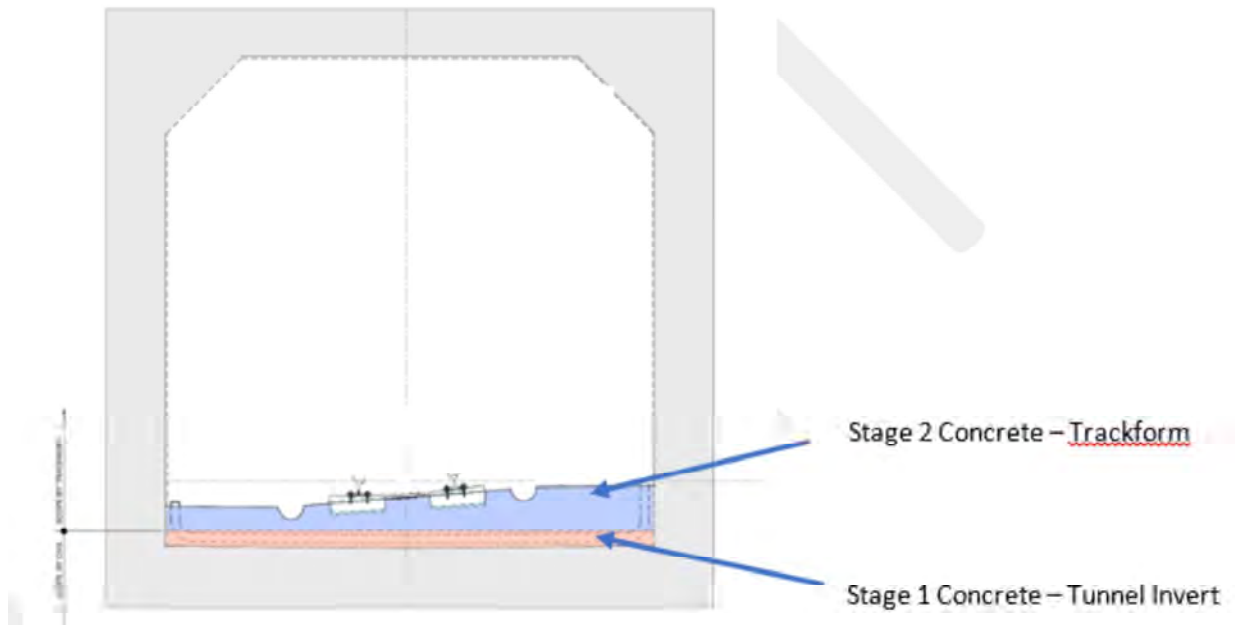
Tunnel section depicting Stage 1 and Stage 2 concrete
